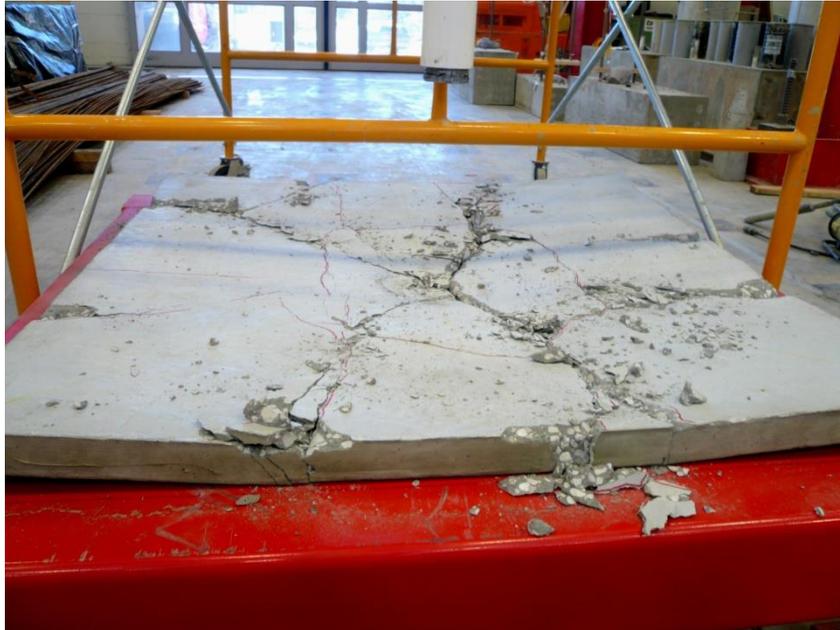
Typical Top of WWR Panel Failed Specimen
